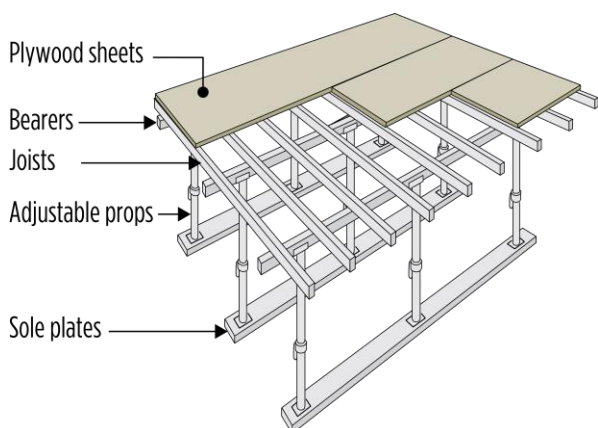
Typical Soffit Forms and Falsework (diagrammatic only; bracing not shown)
